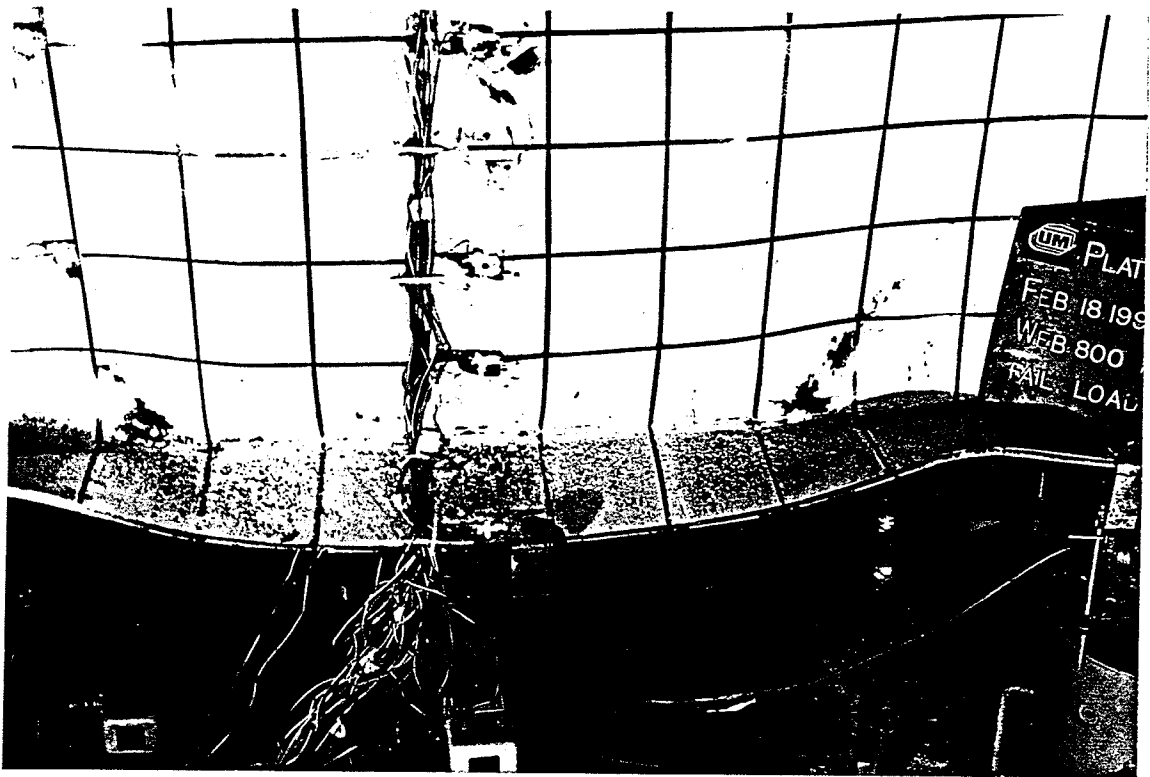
Rotated Compression Flange of Specimen G2 at Failure
